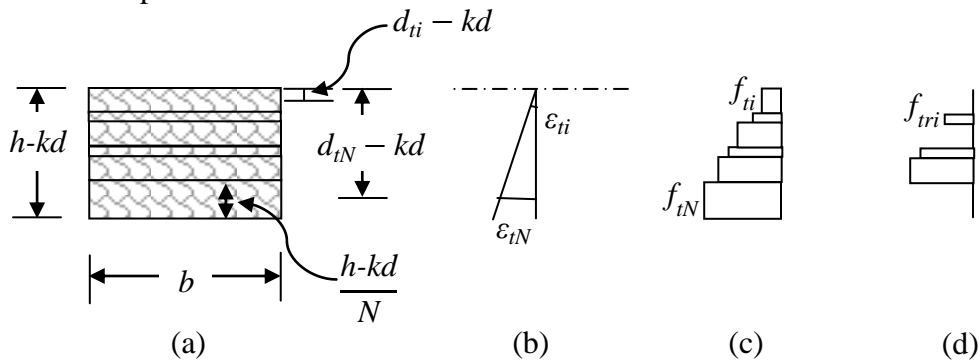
(a) Concrete tension side strips, (b) strain distribution, (c) stresses and (d) concrete stresses at reinforcement layers
